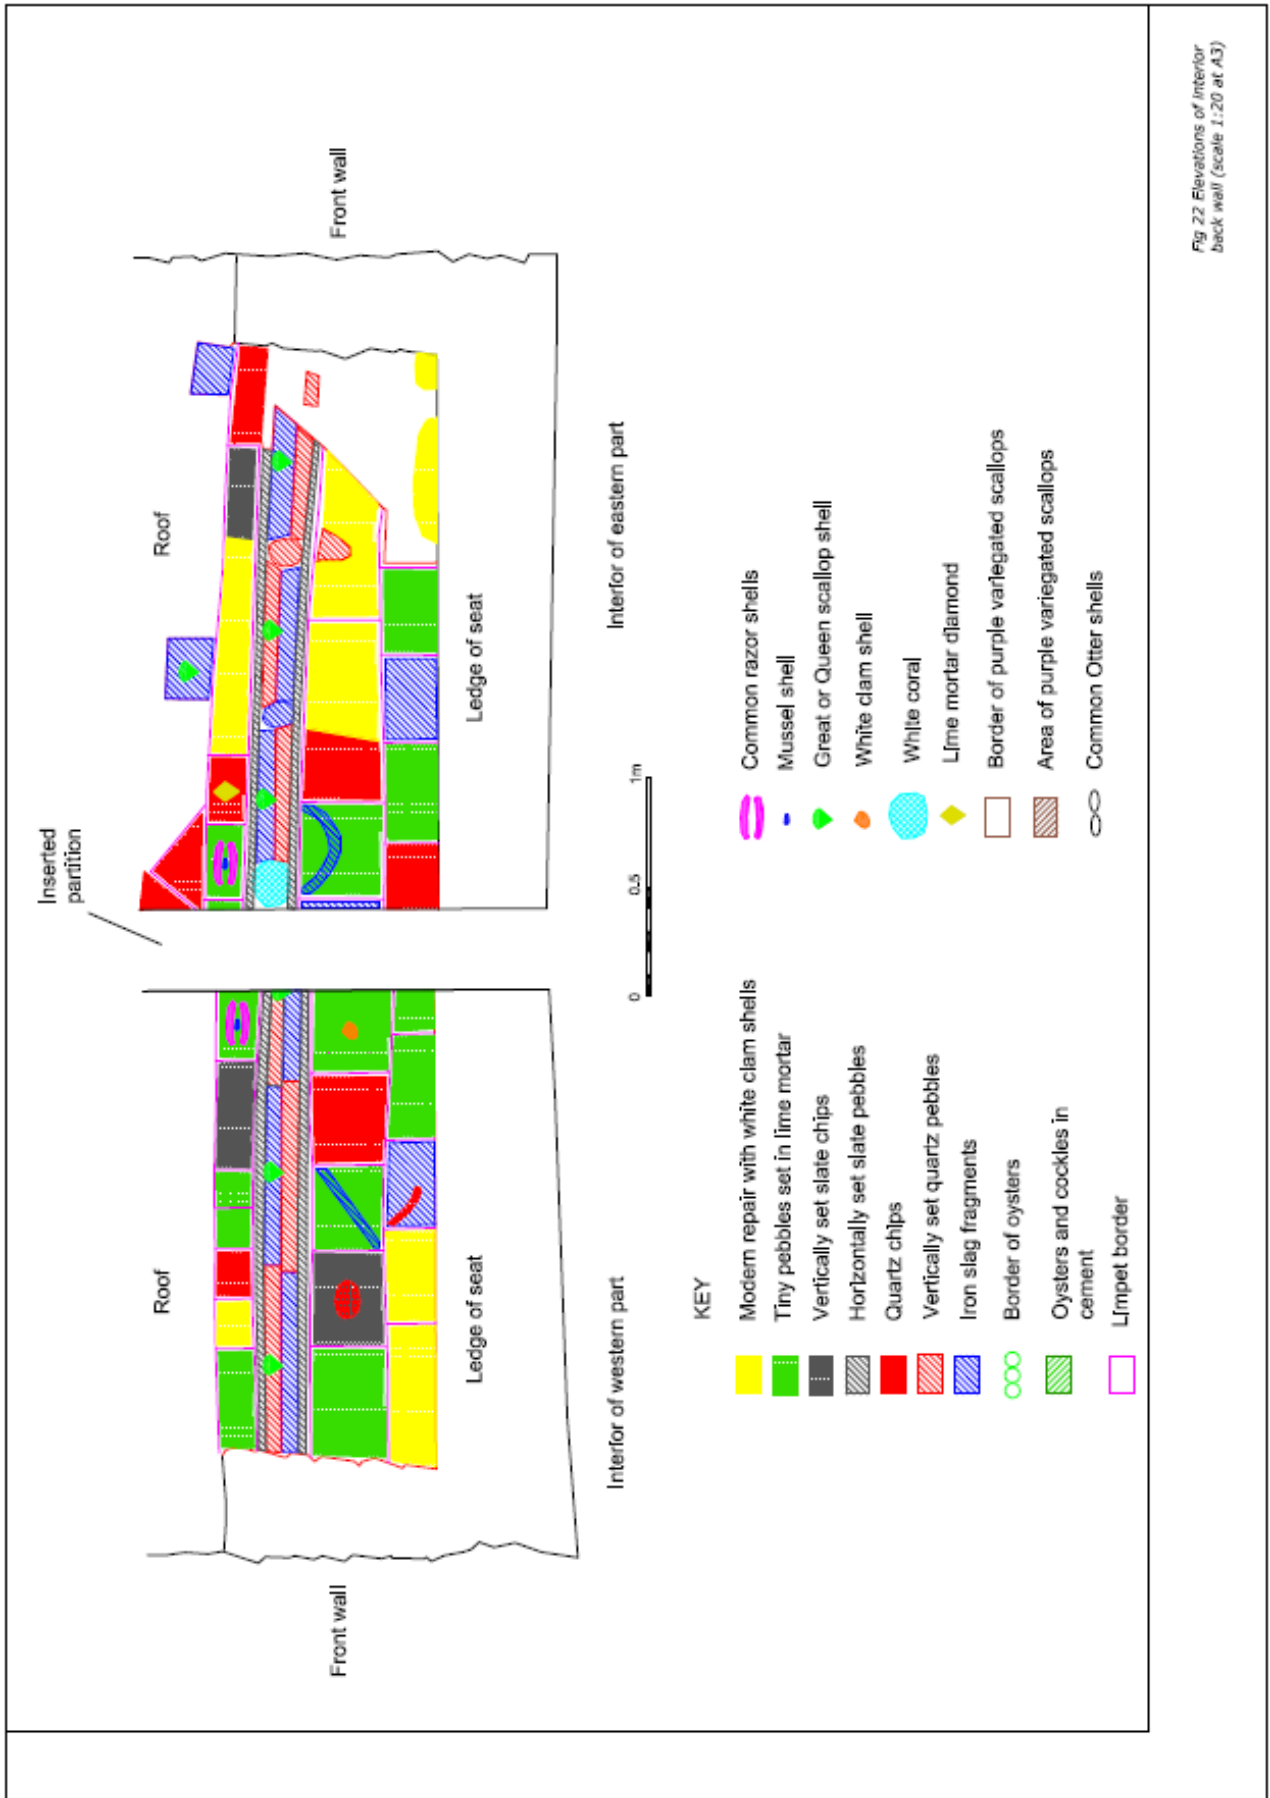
Elevations of interior back wall (scale 1:20 at A3)
